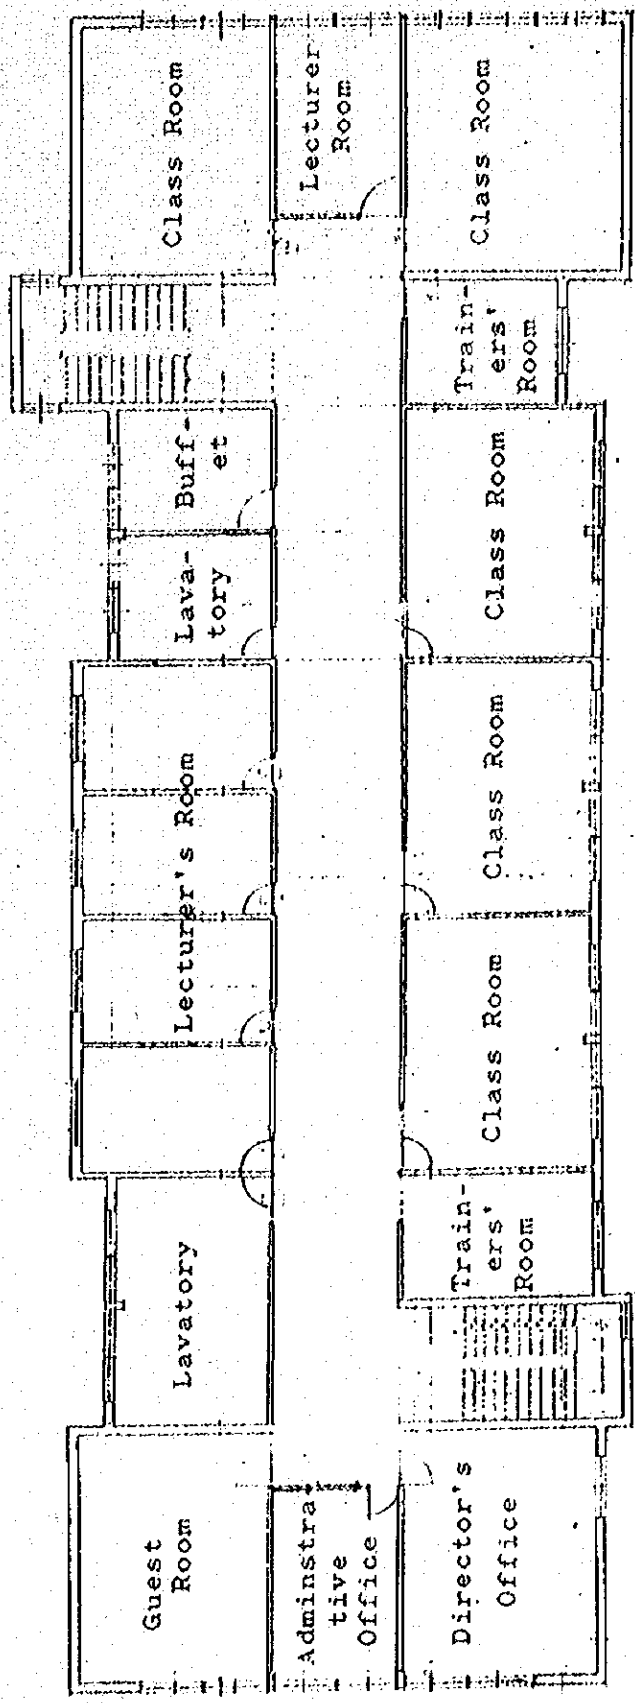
Plan of SHSU Educational Building (1st Floor)
